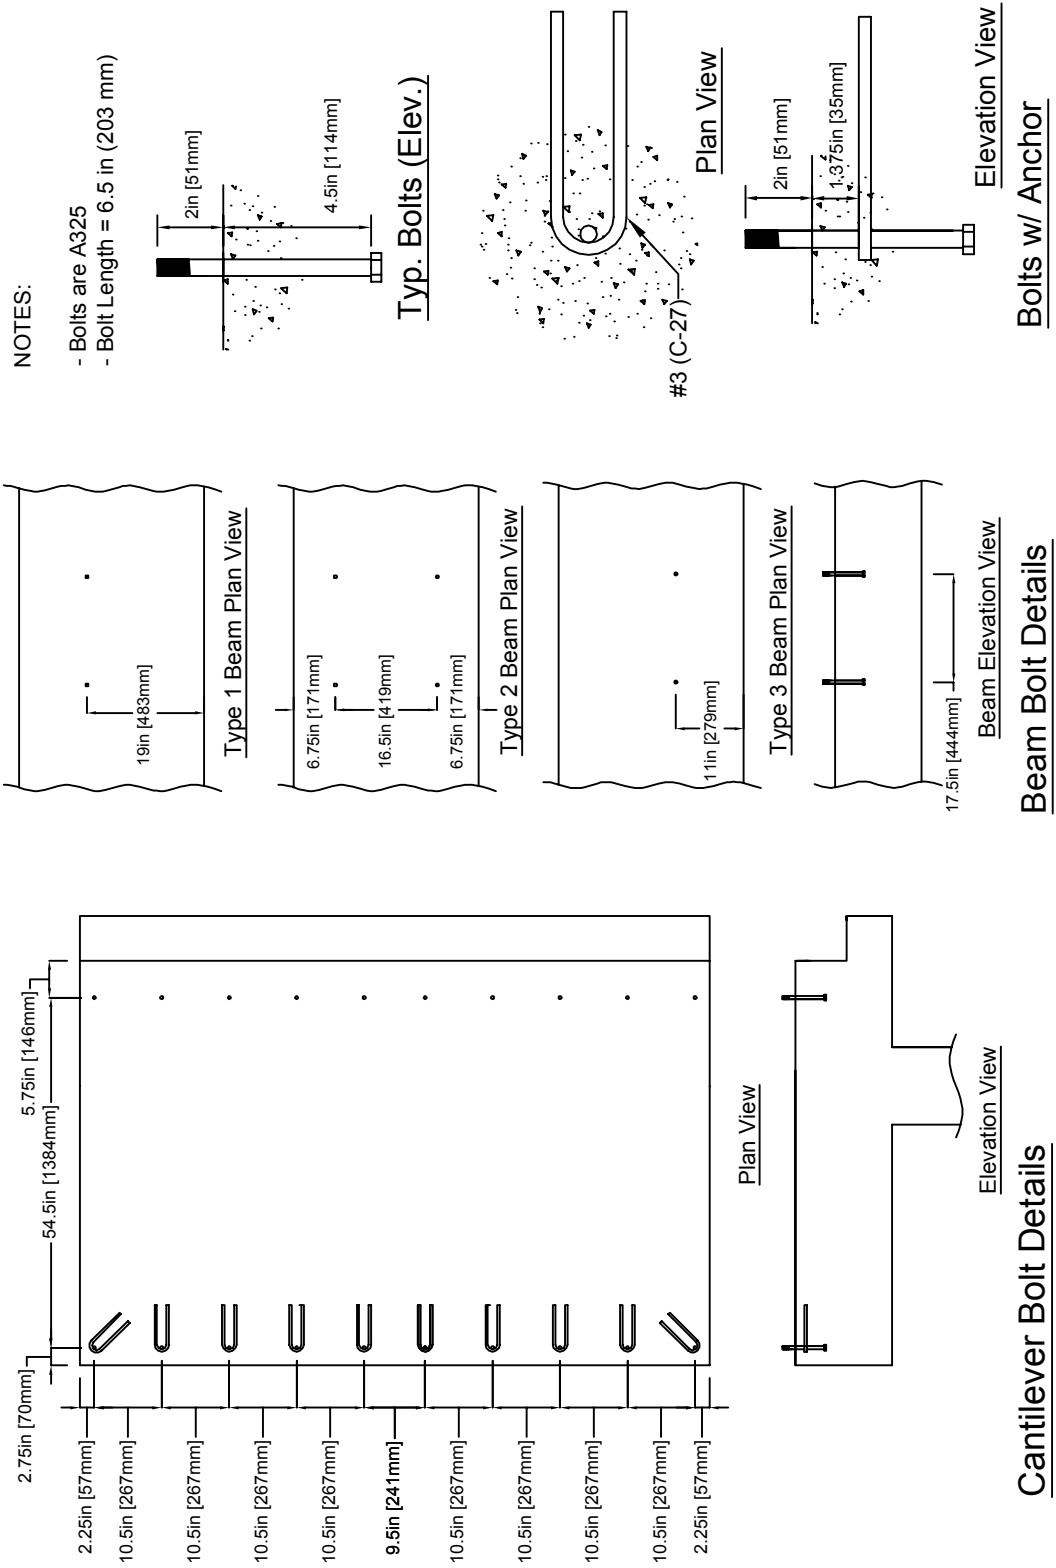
Bridge Plans Sheet 18; Bolt Details.
